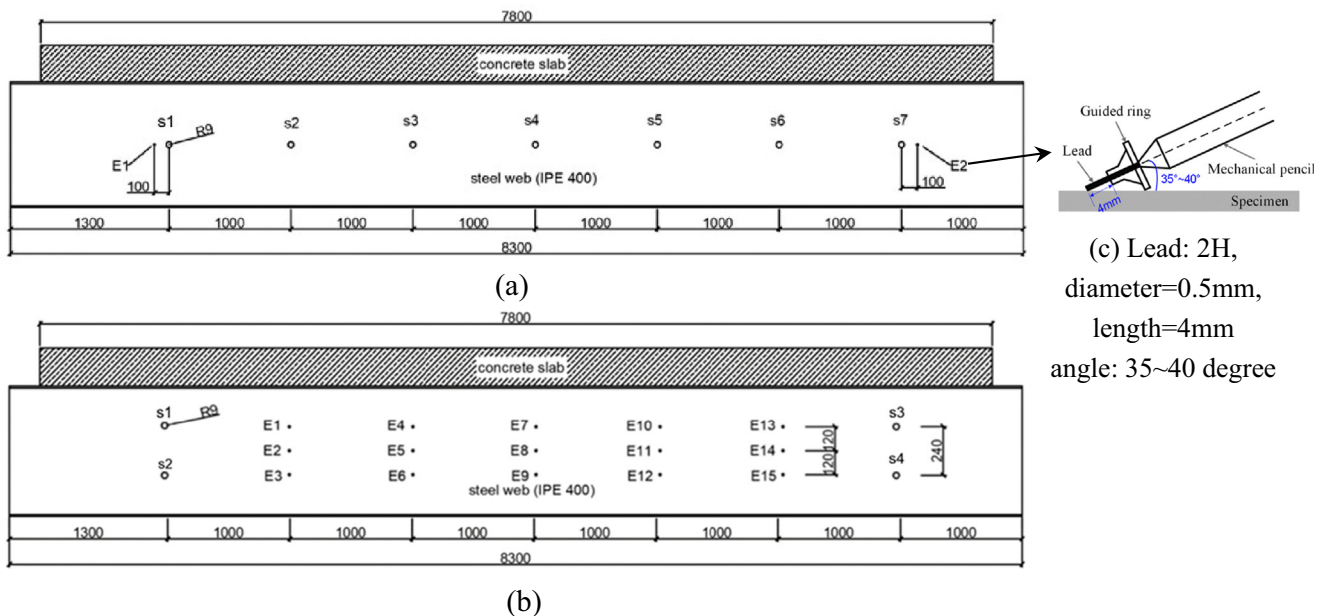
Measurement setup including source location and sensor layout: Schematic view (a) Linear array (seven sensors); (b) Rectangular array (four sensors) and (c) Standard pencil leads breaking.
